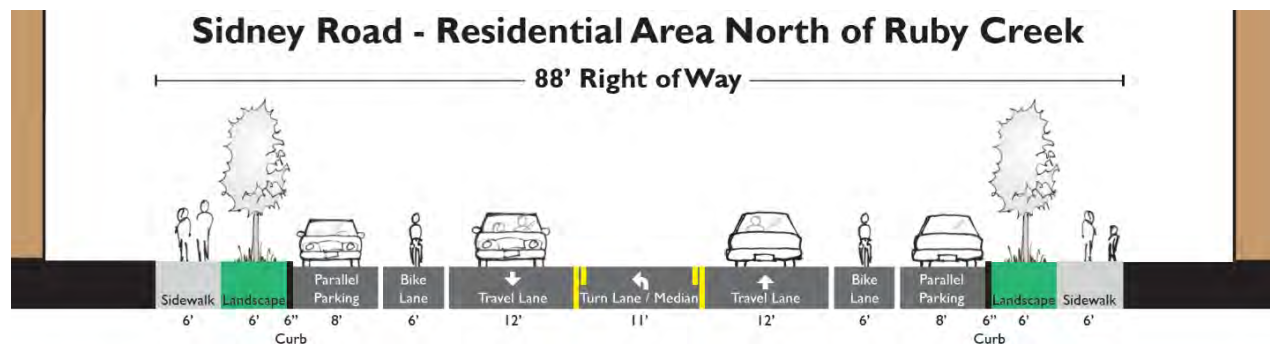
Sidney Road SW. This road section would be used in the center to the north of the Ruby Creek crossing.
